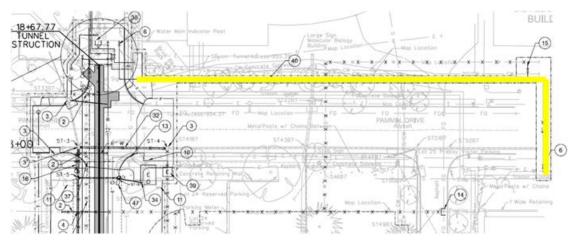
Plan view of project site taken from plan set; bore path in yellow
